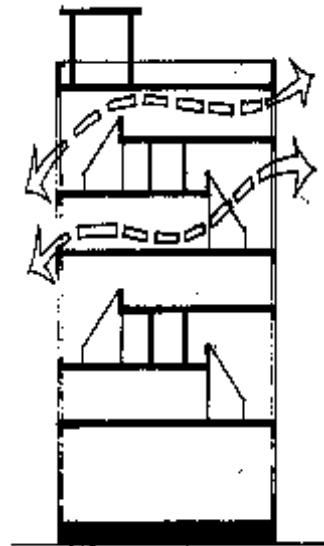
Good cross ventilation can be achieved with double orientation apartments having split levels and corridors on alternate floors.
